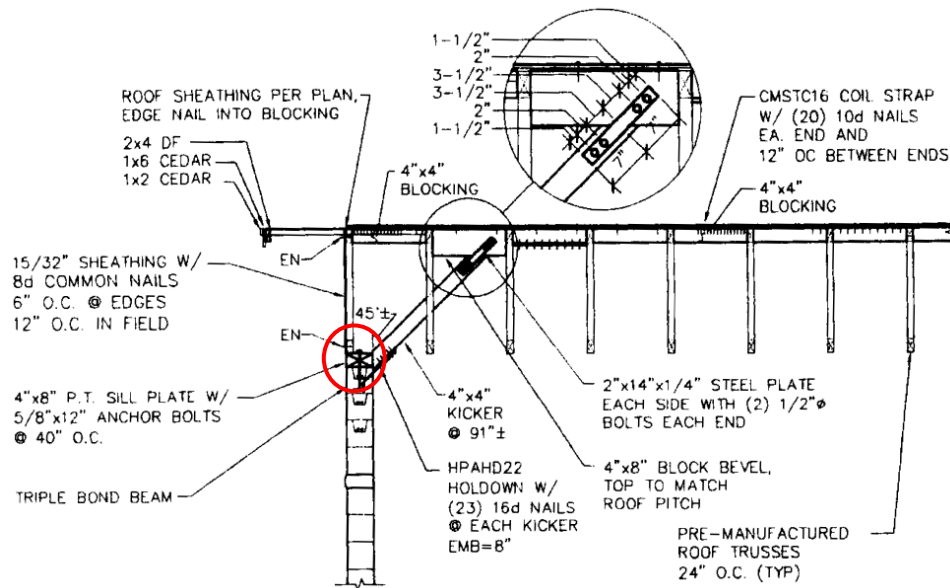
Inadequate Connection between Sheathing and Masonry Wall Top Plate
